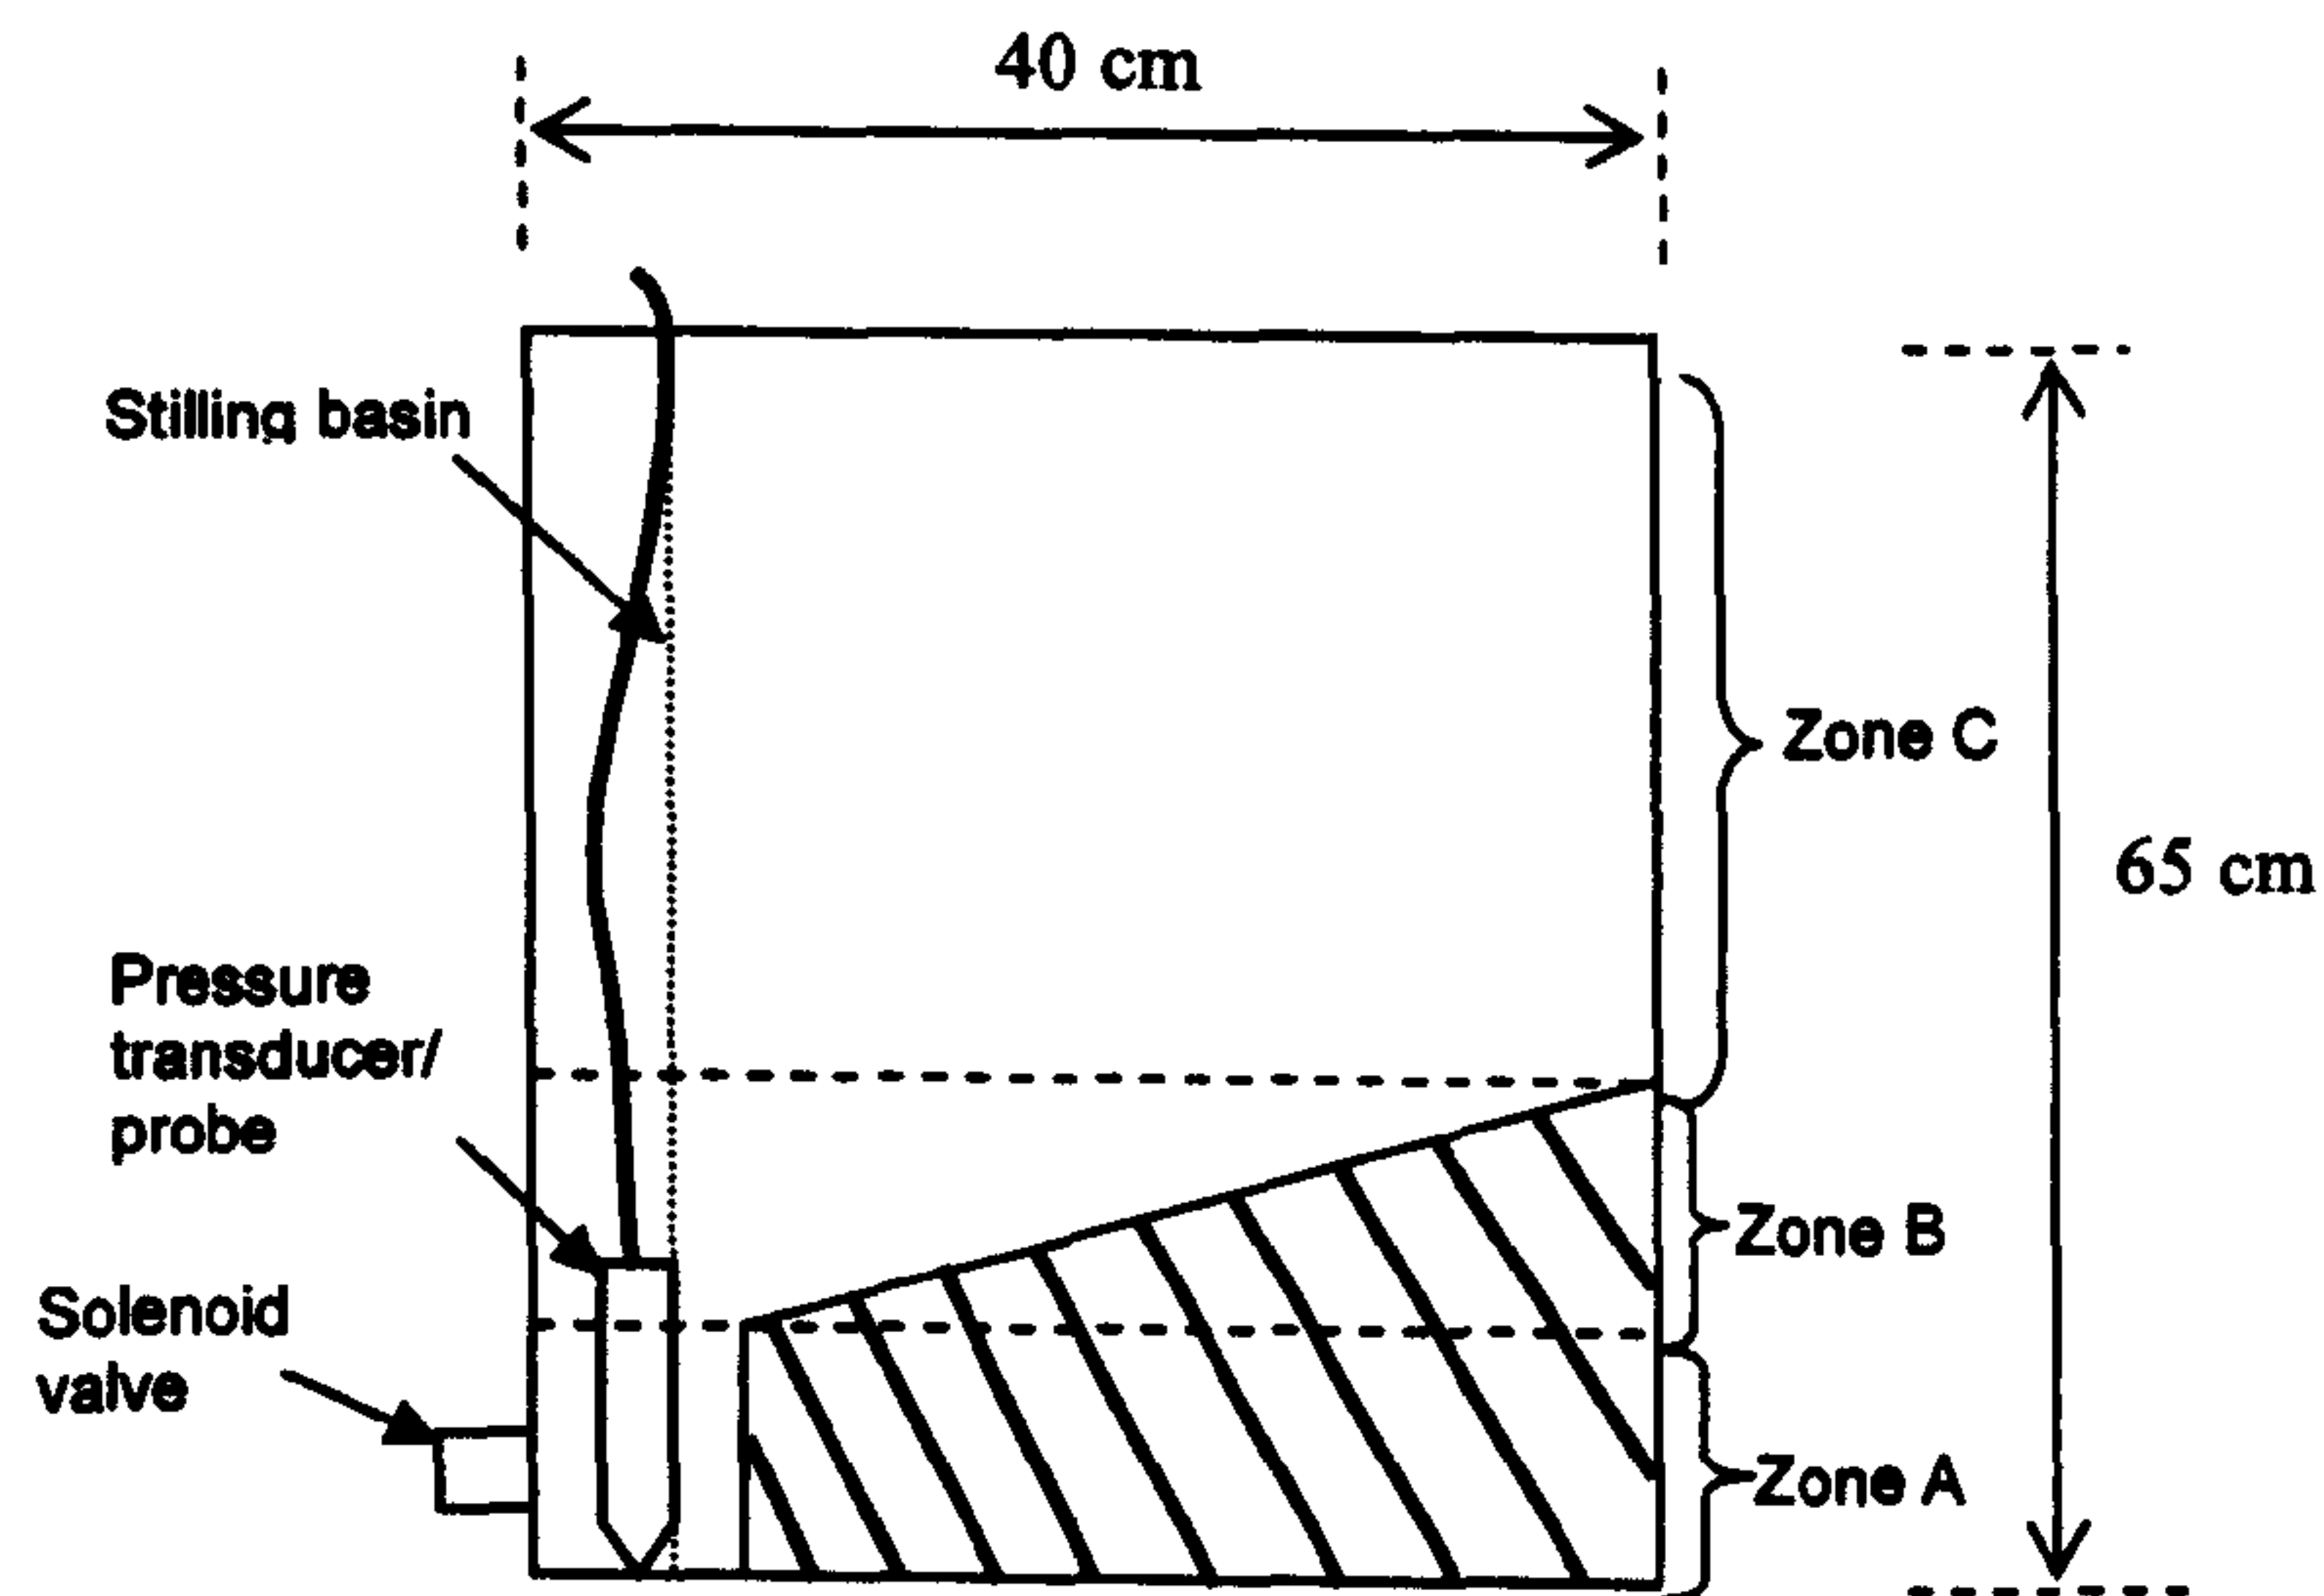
Vertical cross-section showing the profile of the storage tank/rain barrel on Mappin Building (Barrel)
